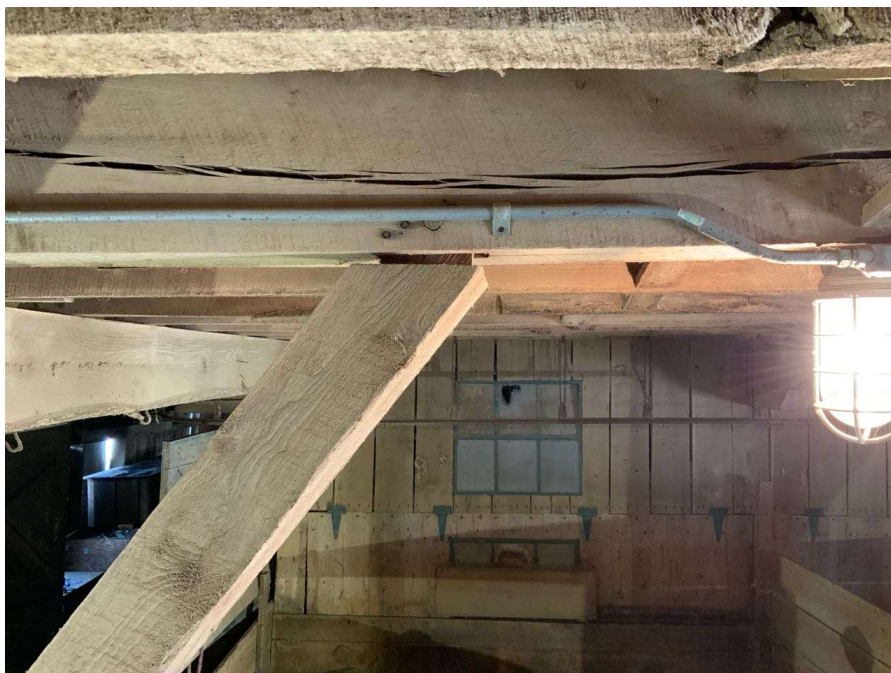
The south brace at Column G/2 at grade level has a 1" gap at the top connection to the floor beam where the brace is dropping down (looking east).
